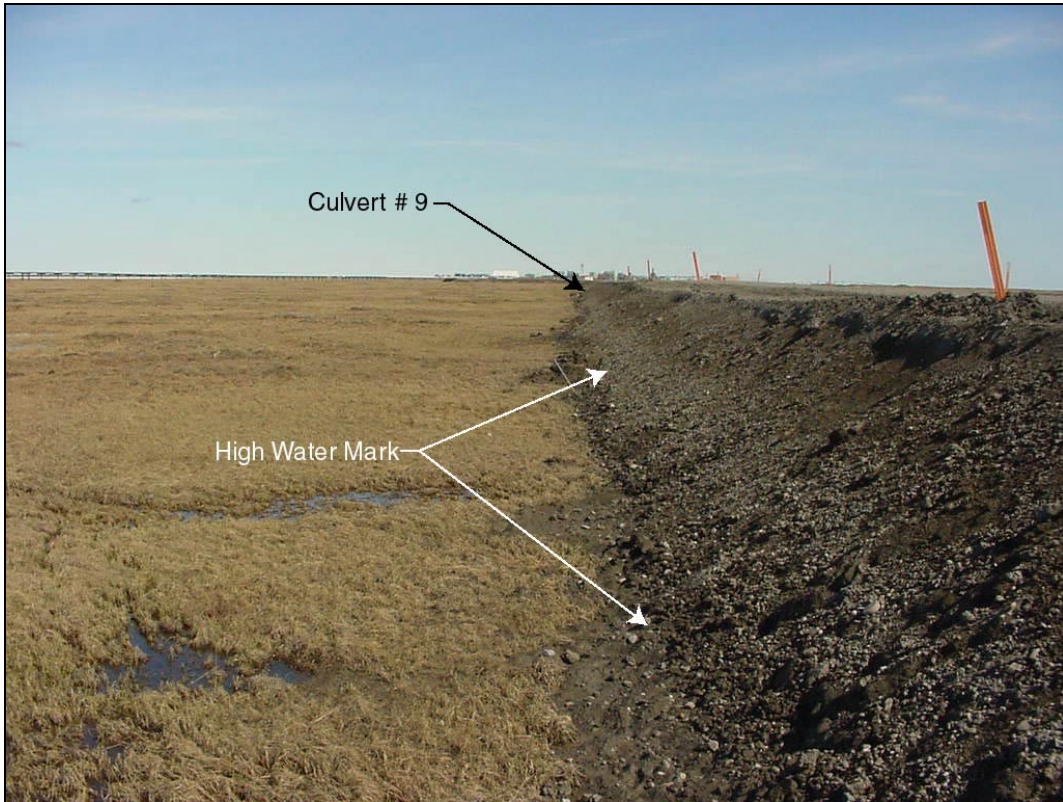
Facing east from Culvert #24 along the south side of the CD-2 access road. Photo taken June 16, 2001.
